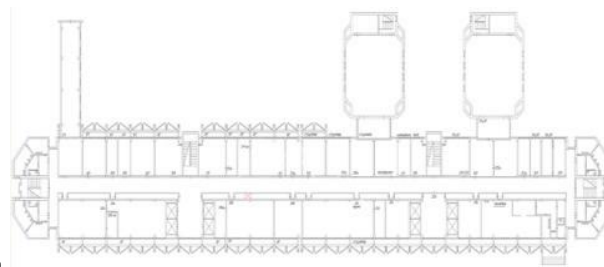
KazNRTU building plan (main academic building, 2nd floor)
